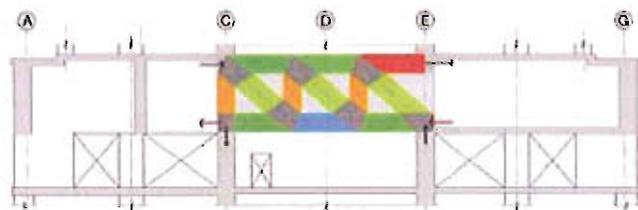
A strut-and-tie model was used for design of the shearwall web at the outrigger connection
